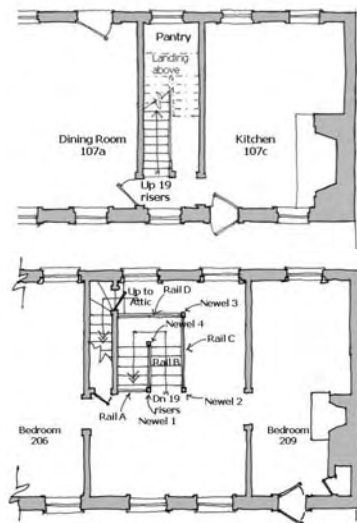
First floor plan, east end of current Room 107, showing the original arrangement of the back hall, stairs, and pantry (above); Second floor plan, east end, current Room 207, showing the original arrangement of the back stairs, opening, and access to the attic (below). (GWWO, 2005.)
